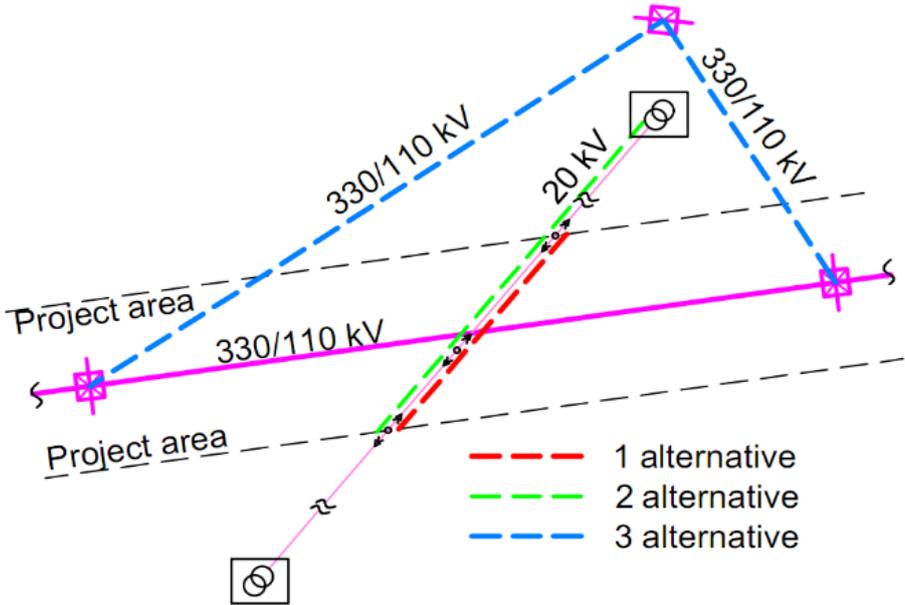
Layout of PTL reconstruction design with solution alternatives.
